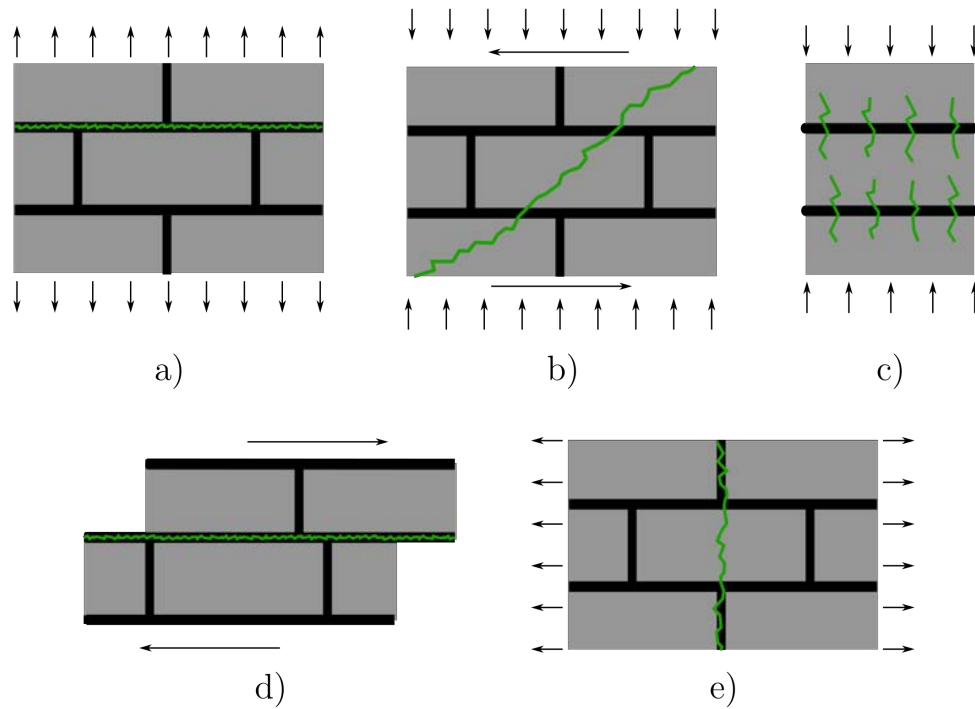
In-plane crack mechanisms of masonry: a) cracking in the joint, b) diagonal cracking of brick units, c) splitting of brick units due to dilatancy in the mortar joints, d) sliding of the bricks along the mortar joints, e) cracking of the bricks in direct tension
